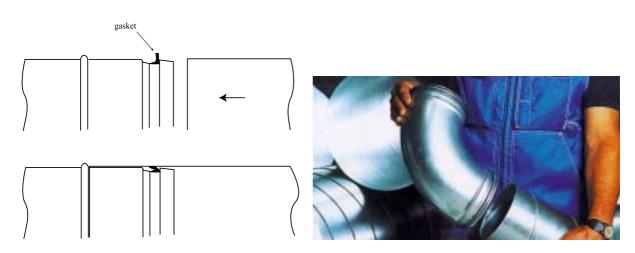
Pre-fitted sealing gaskets for circular ducts. Airtight rivets or plate-screws may be necessary to ensure the mechanical stability of the joint.
